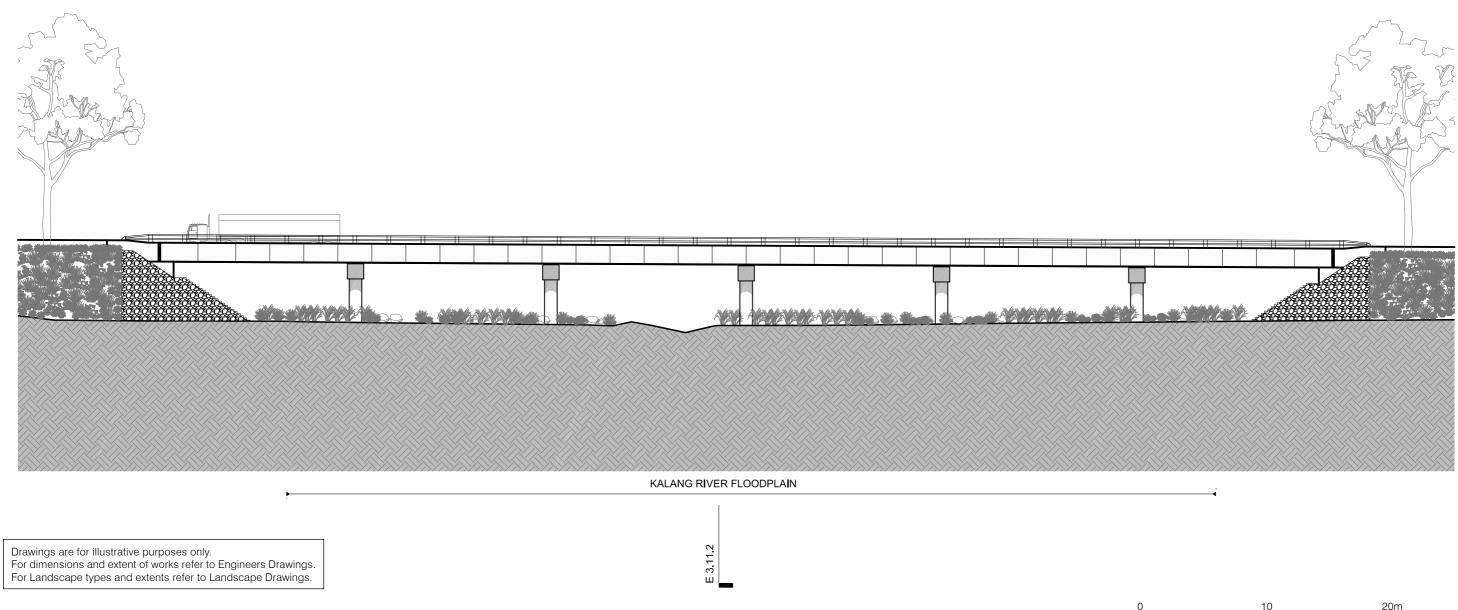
Twin Bridges over Kalang River Floodplain: Elevation
